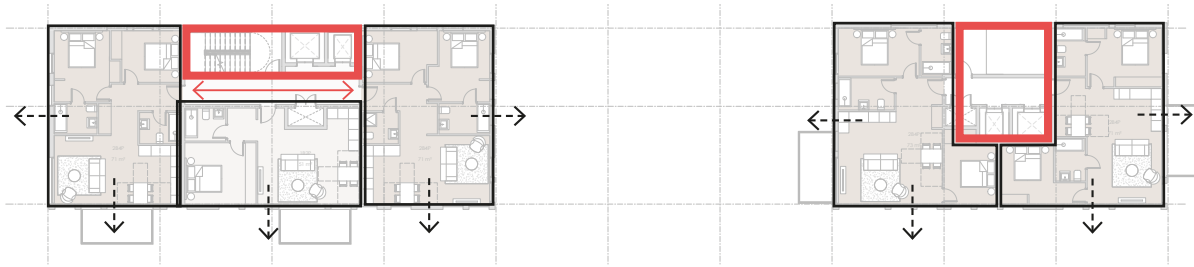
Plot 10 A - Level 07 (Typical Upper Floor Plan)
